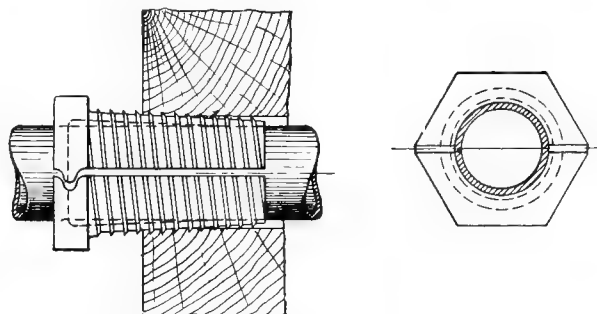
Acme Pipe Clamp for Use in Needle Beam. Western Railway Equipment Company.
